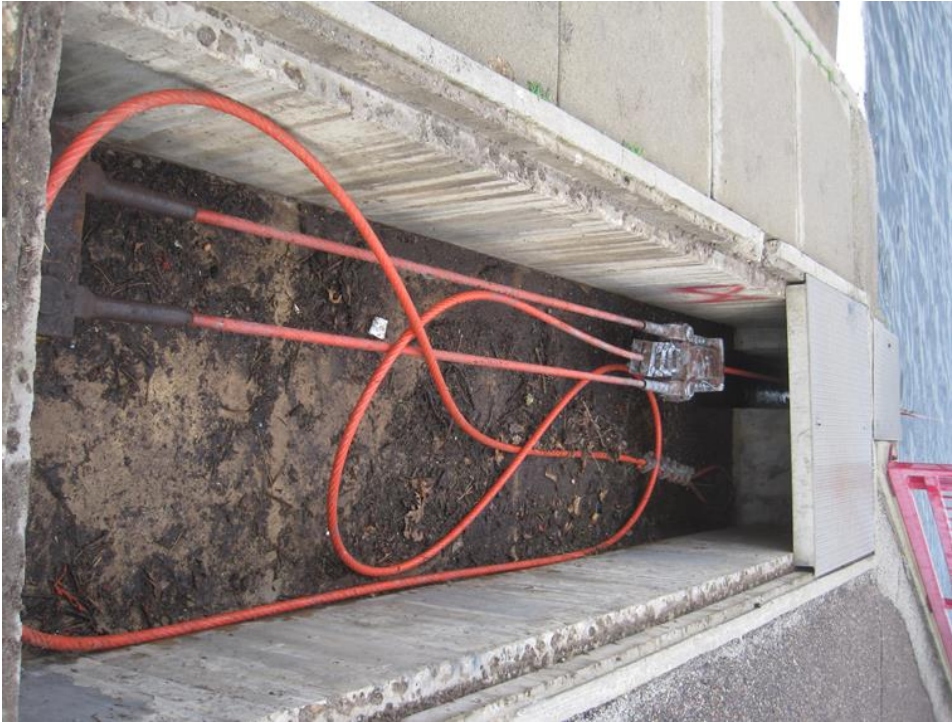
Corrosion of short anchor cables and main cable wedges, southeast guide cable anchor pit.
